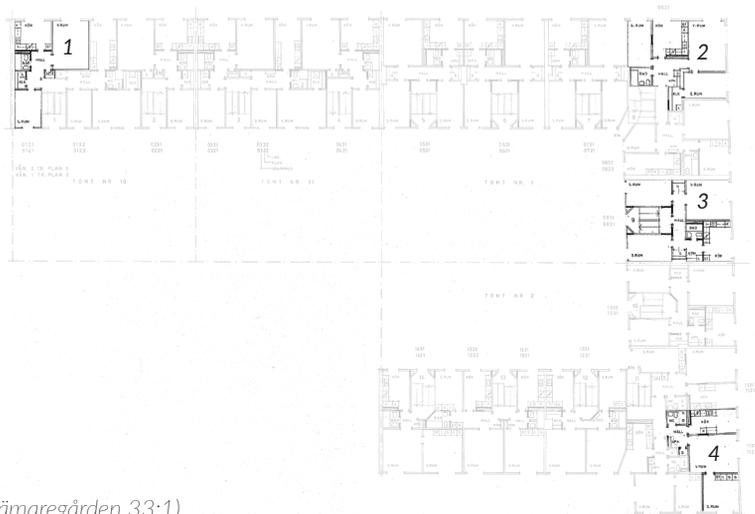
Floor plan of Kv. Tuppjätet, 1:1000. (Brämaregården 33:1).
